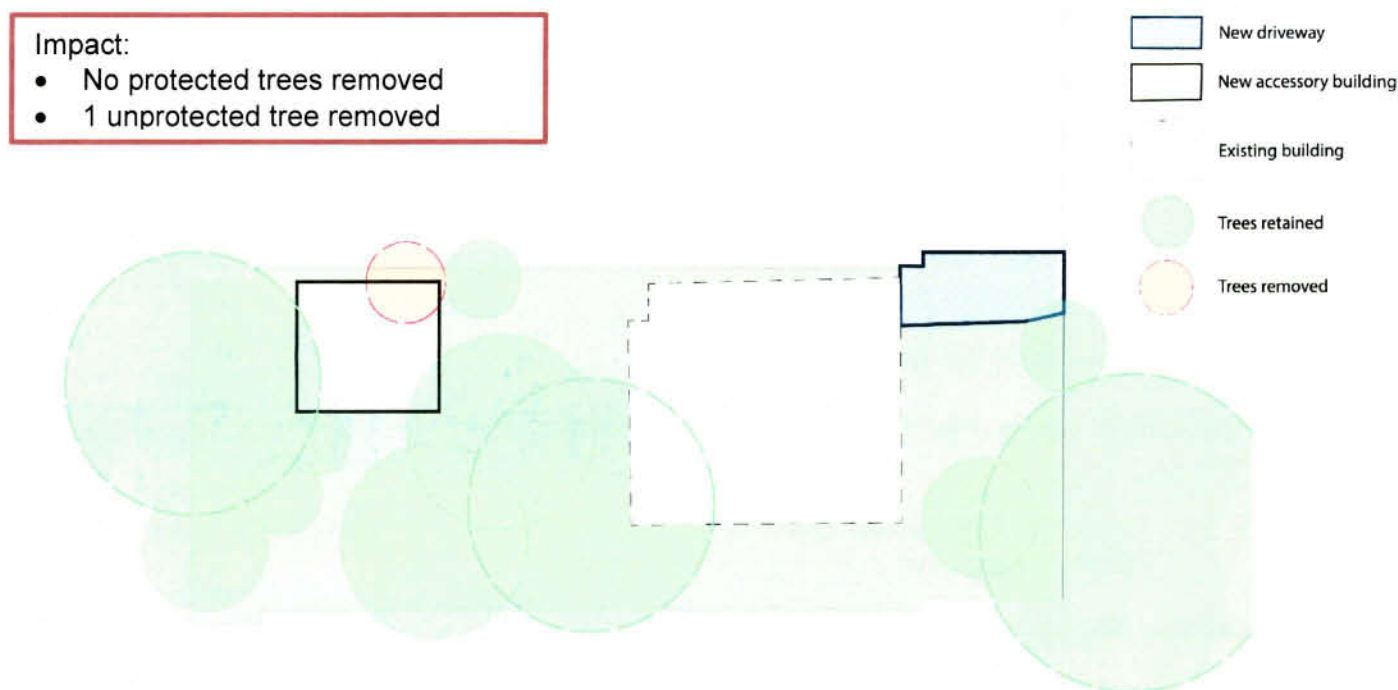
Under the amended Bylaw, the City could require that the accessory building and driveway be placed in locations that make unnecessary the removal of as many protected trees as possible.
